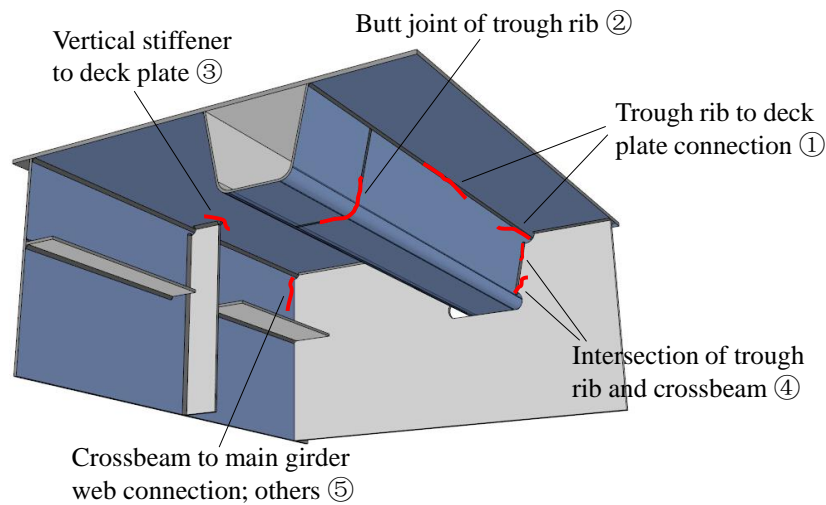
Typical fatigue cracks in orthotropic steel bridges
